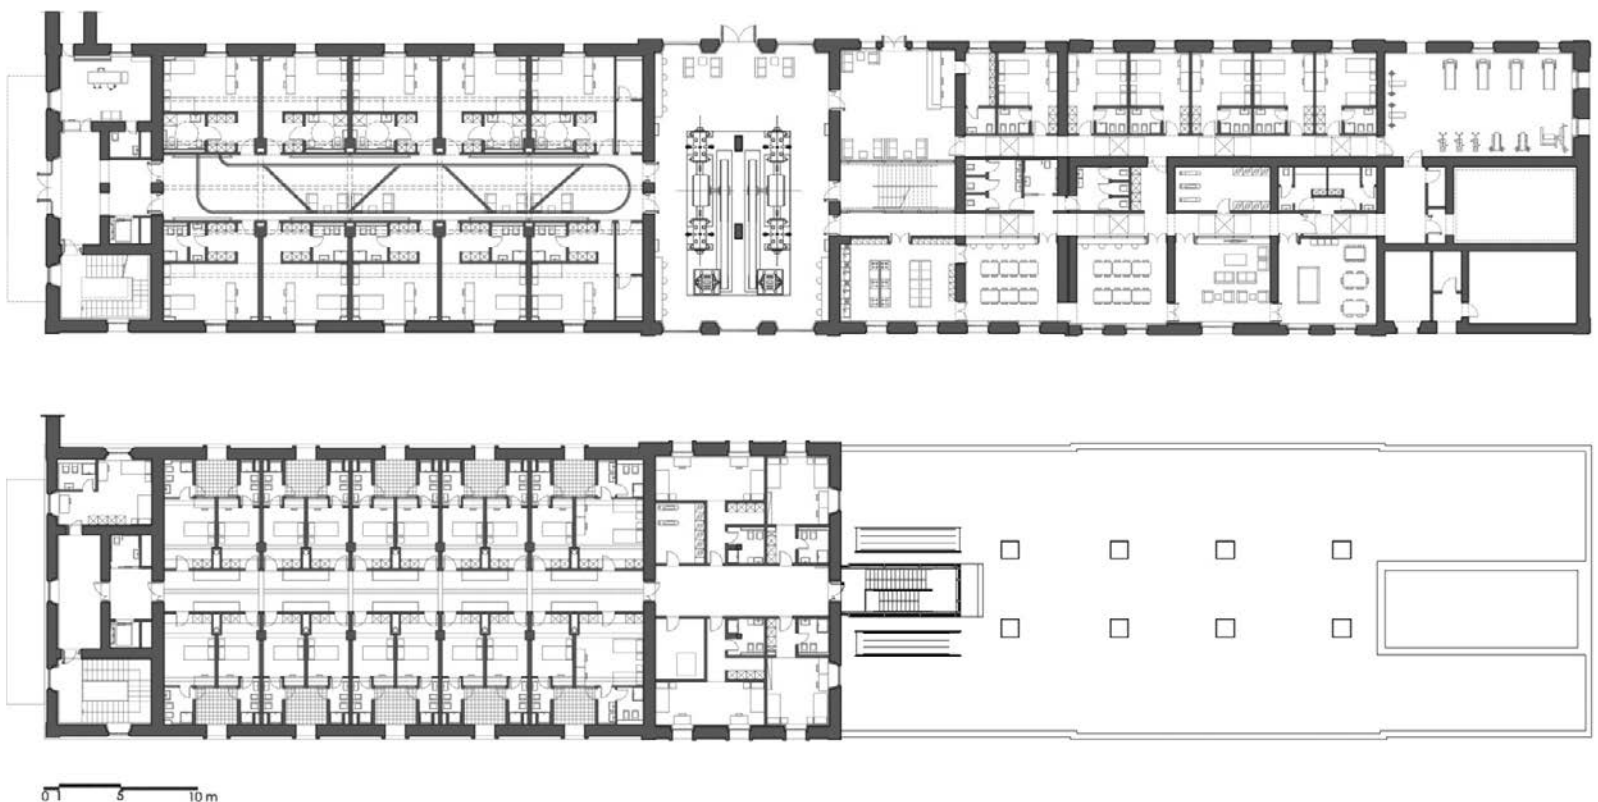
Ground and second floor layout, project. Next page: The room distribution corridor on the first floor and on the ground floor.
